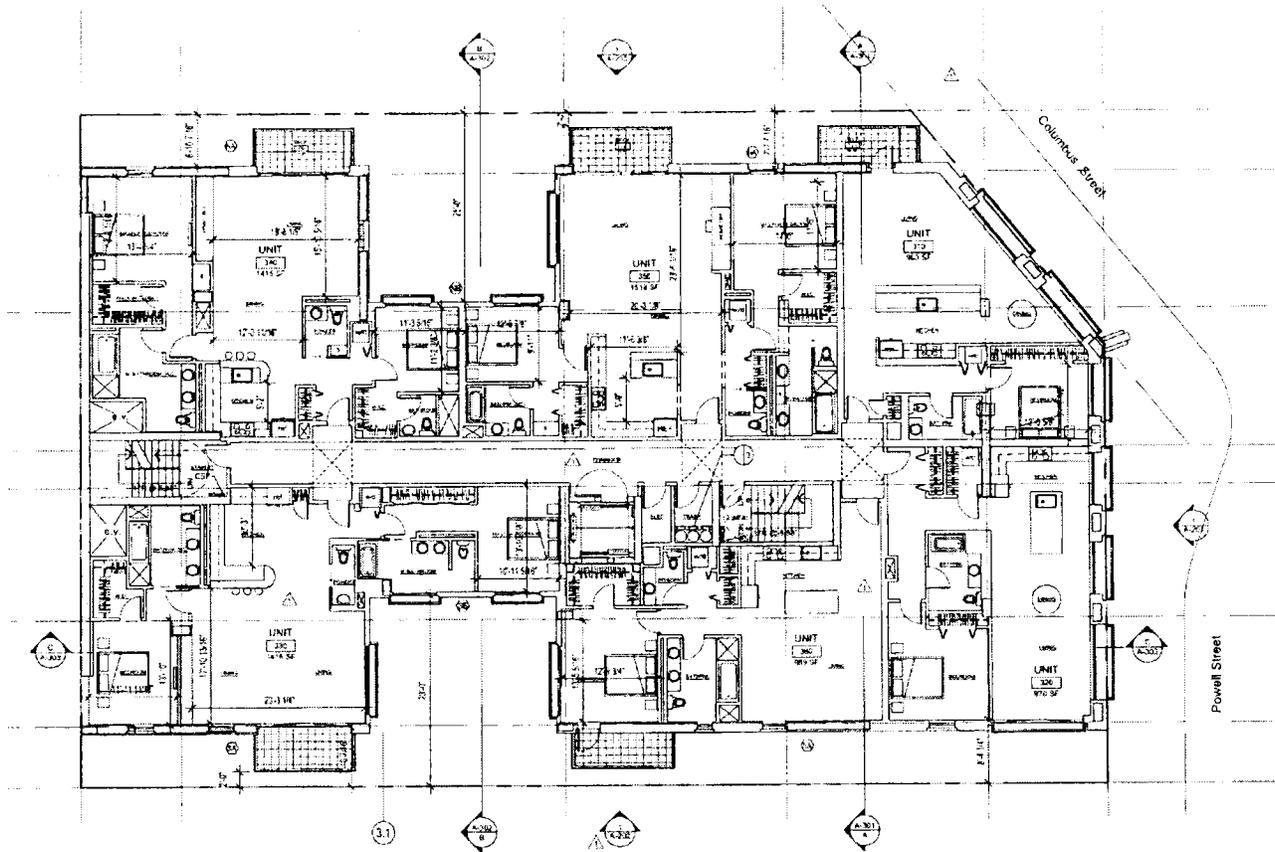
PROPOSED 1731 POWELL ST THIRD LEVEL PLAN
